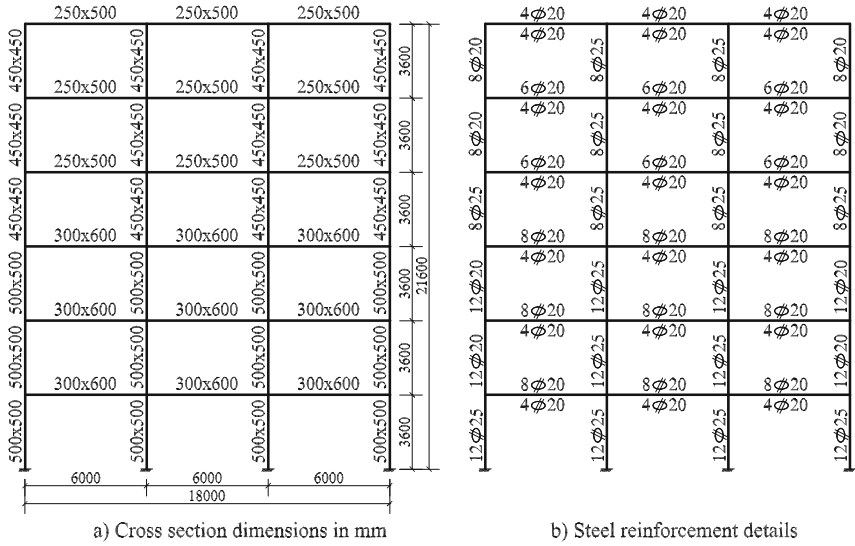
Details of 6-storey reinforced concrete ductile frame
